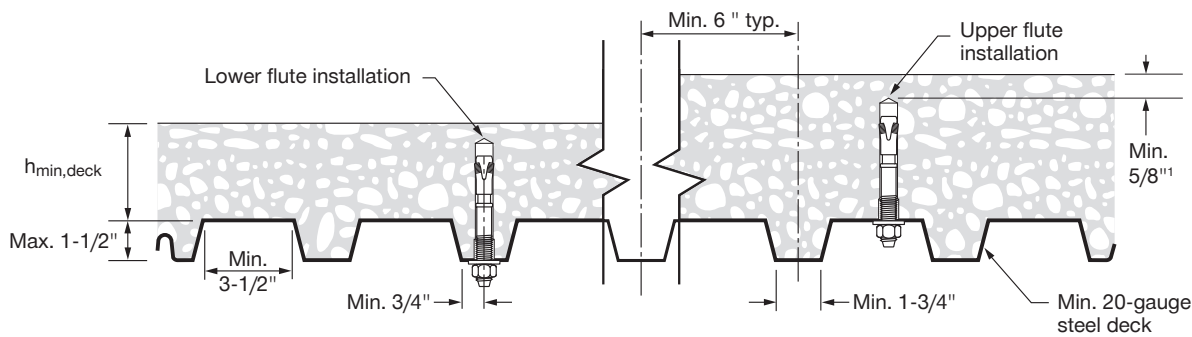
Installation of Hilti KB-TZ2 carbon steel in the soffit of concrete over metal deck floor and roof assemblies – B deck
